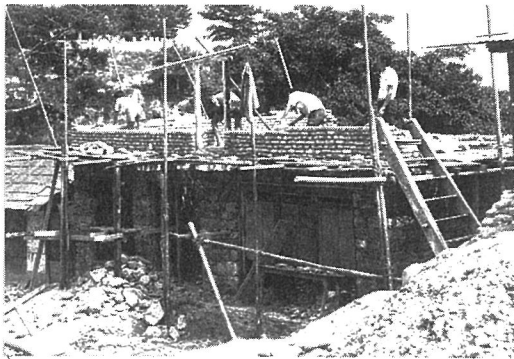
Construction of a mud-stone house in Dharan Bazaar; overall view
